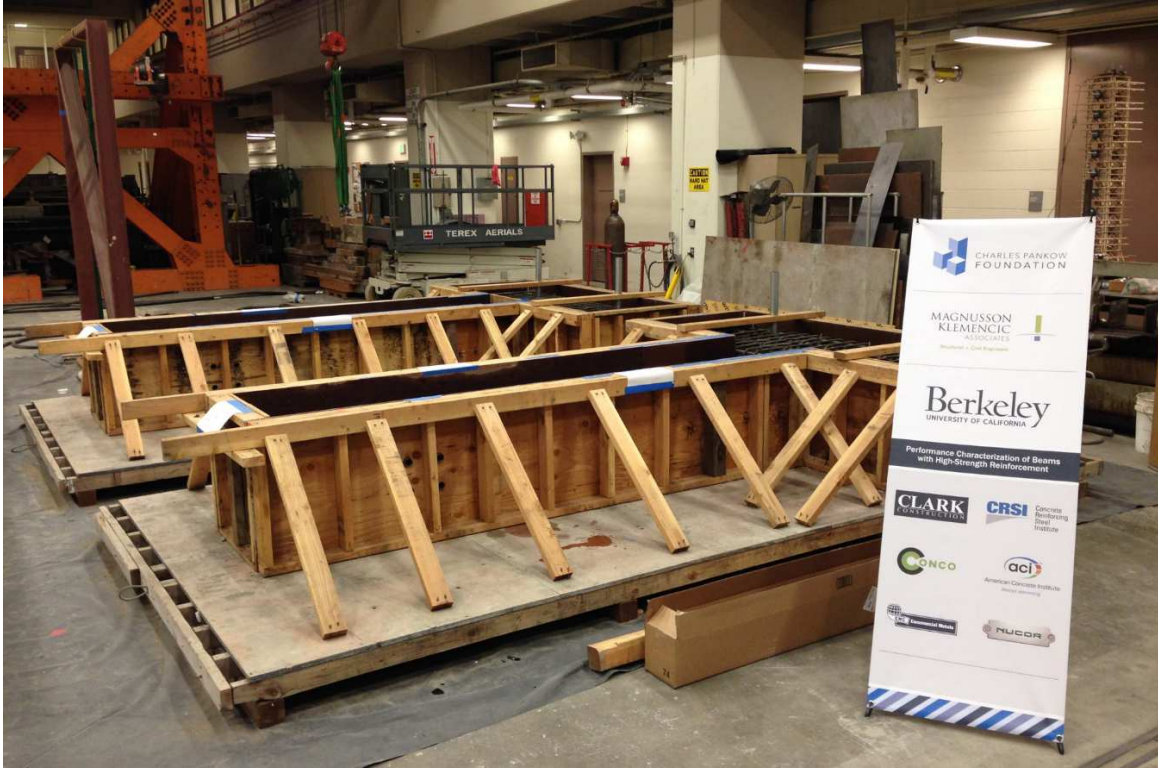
Construction of Test Specimens - Before Concrete Casting
